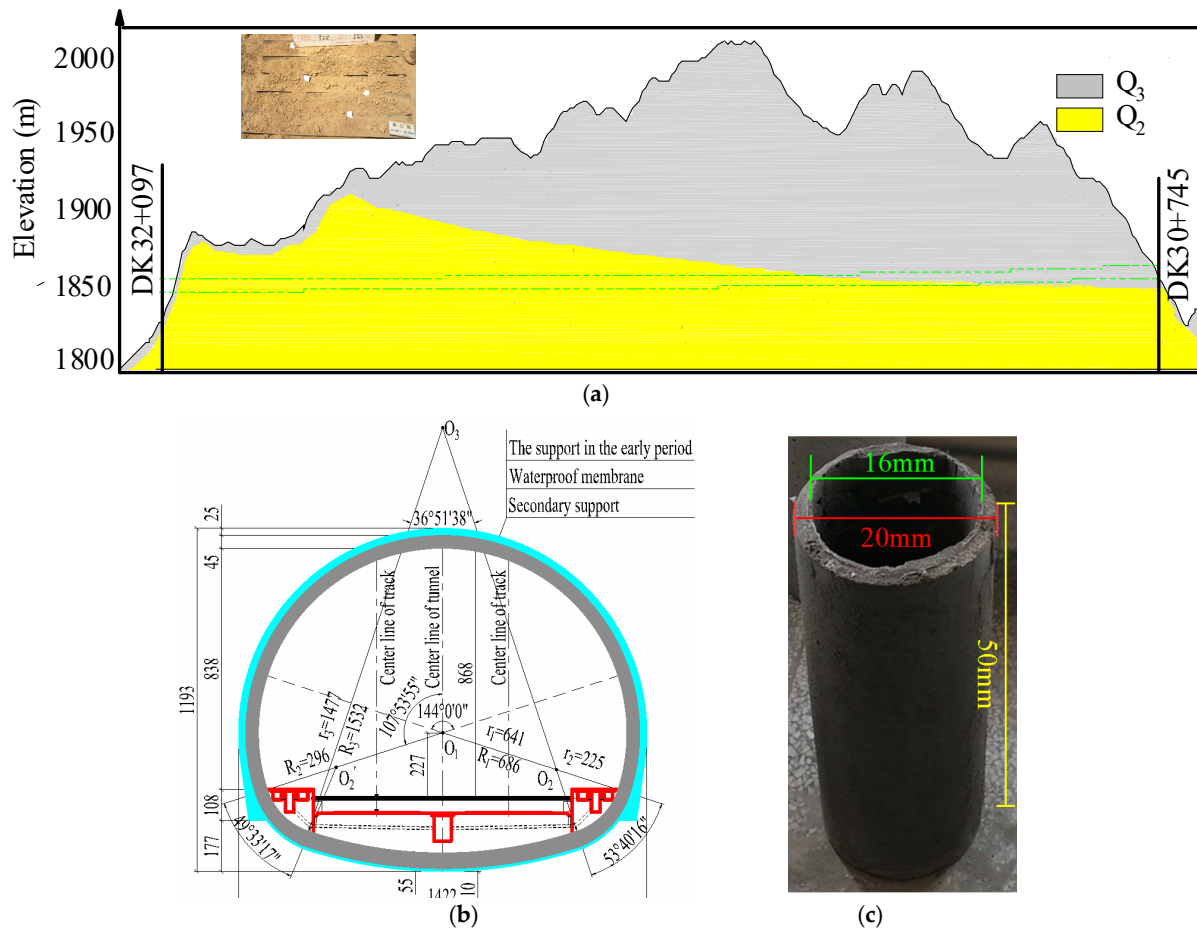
Tunnel cross-section and model. (a) Geological section; (b) Tunnel cross-section (unit: cm); (c) Tunnel model.
